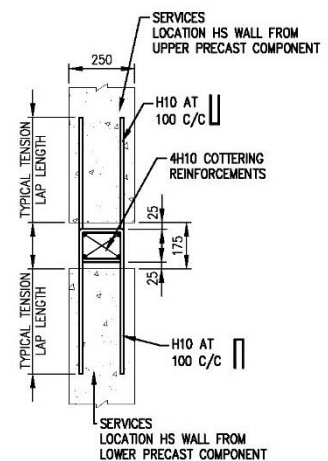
CONNECTION DETAIL AT VENTILATION SLEEVE LOCATION
